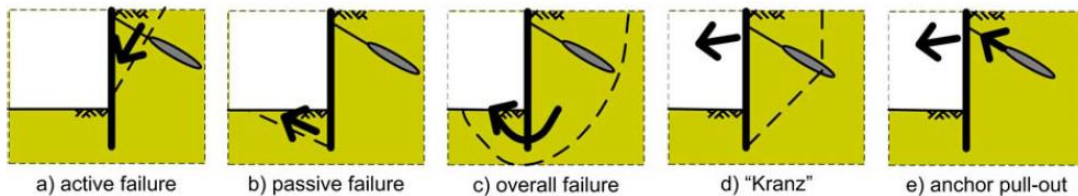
Failure mechanism in the soil for anchored retaining walls [4]
